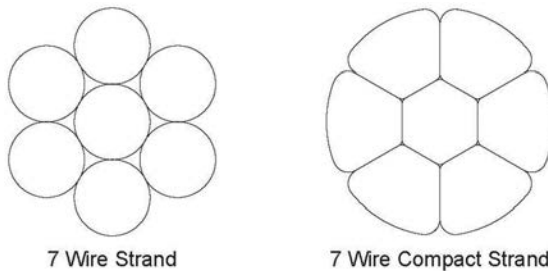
Typical 7 wire strand constructions for prestressing steel. (Courtesy of Standards Australia, 2007b)
